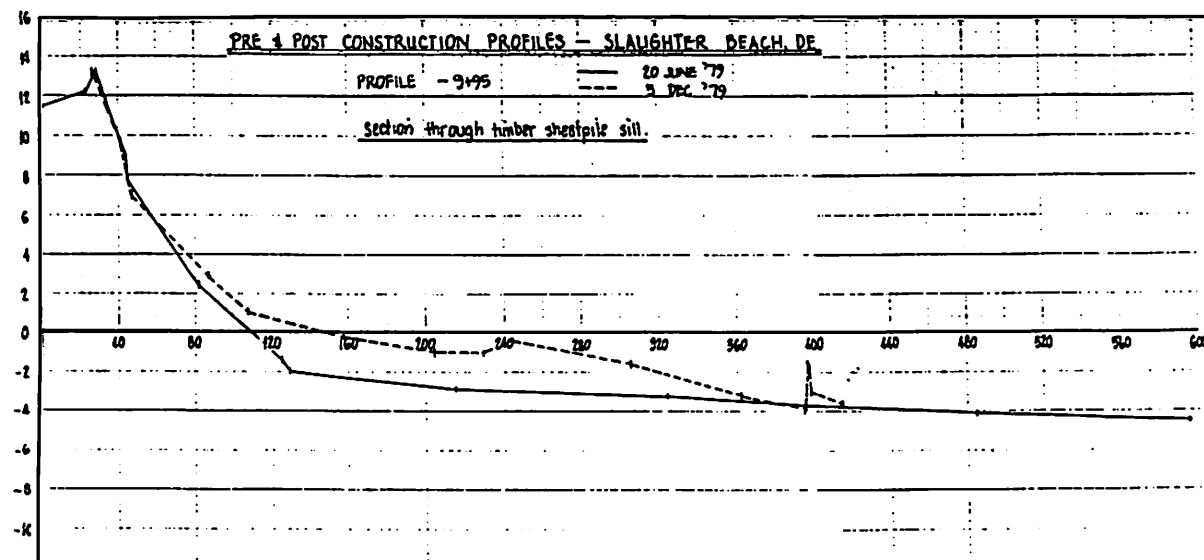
Typical beach profiles through perched beach project — before and after sill construction.
